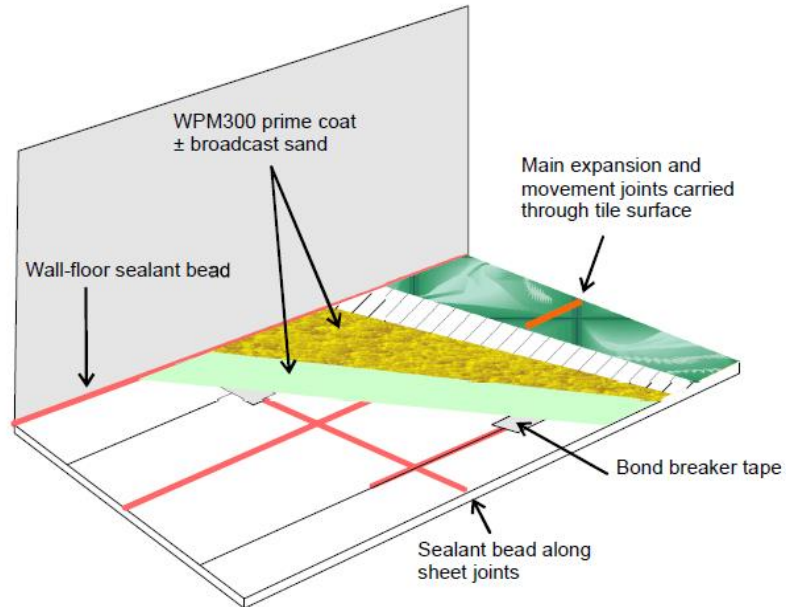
Direct tiling onto the external deck with a squared sheet pattern, no liquid-applied sheet membrane. Falls are created in the deck construction. For this situation, individual applications need to conform to requirements in the NCC and AS4654.
